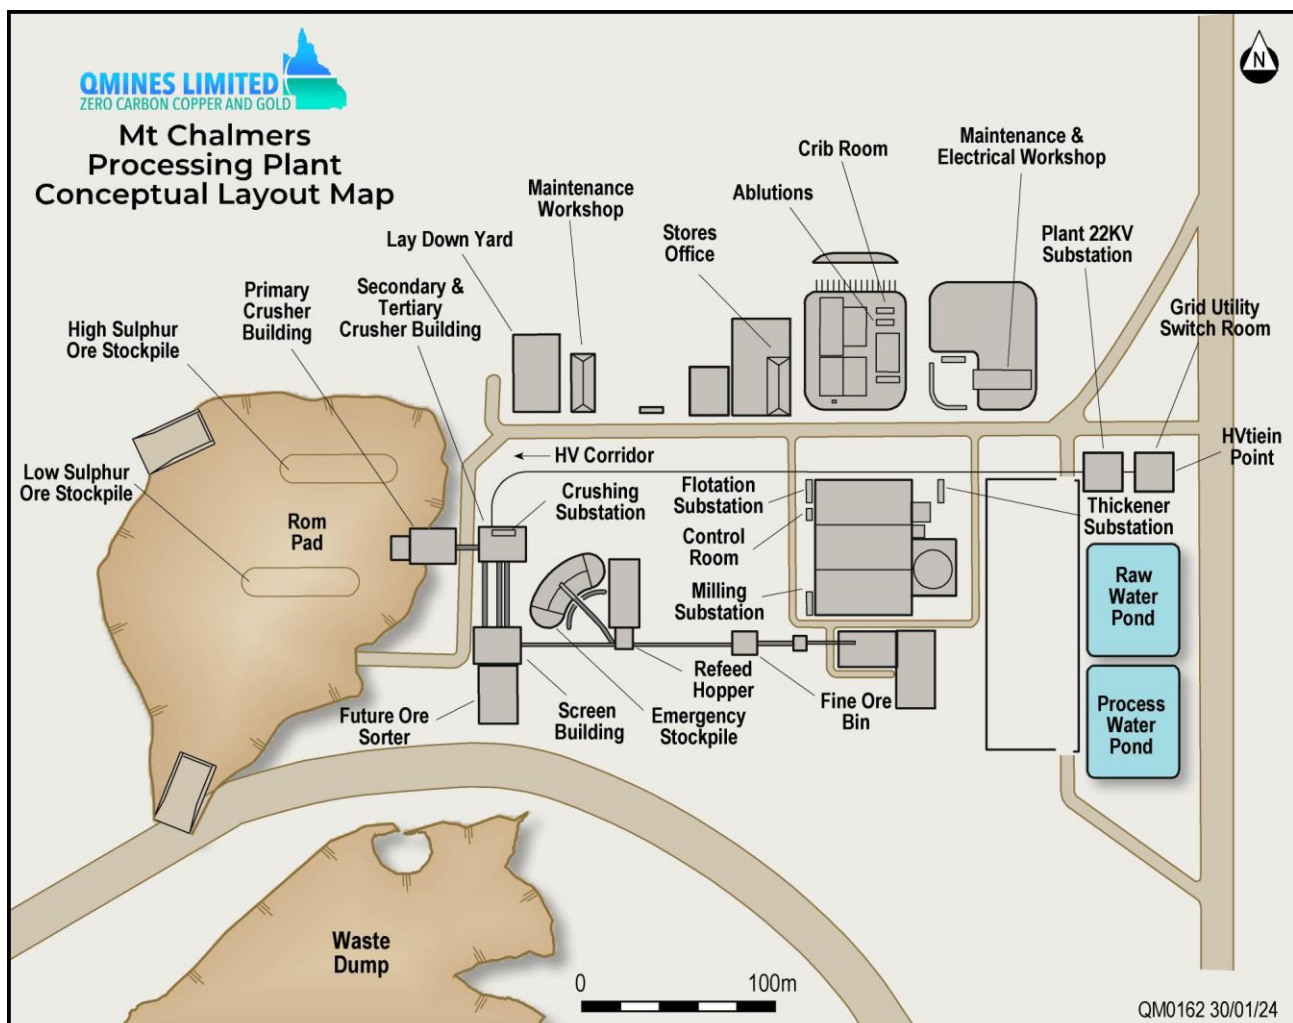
Mt Chalmers conceptual project treatment plant design and site layout.
